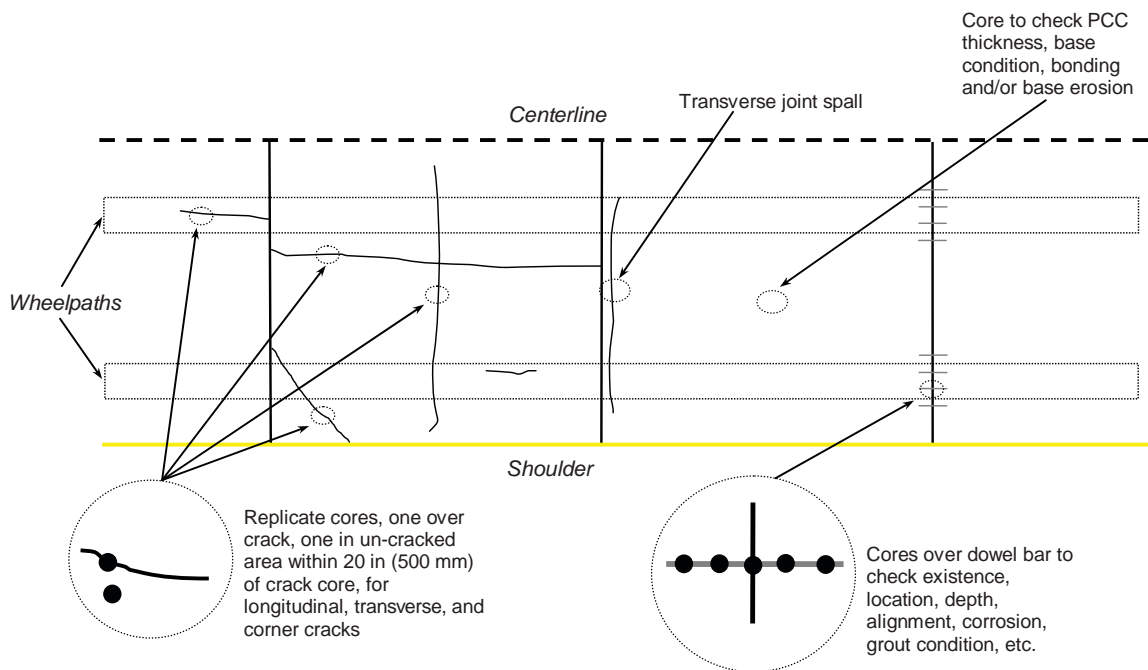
Examples of core locations for jointed plain concrete sections.
